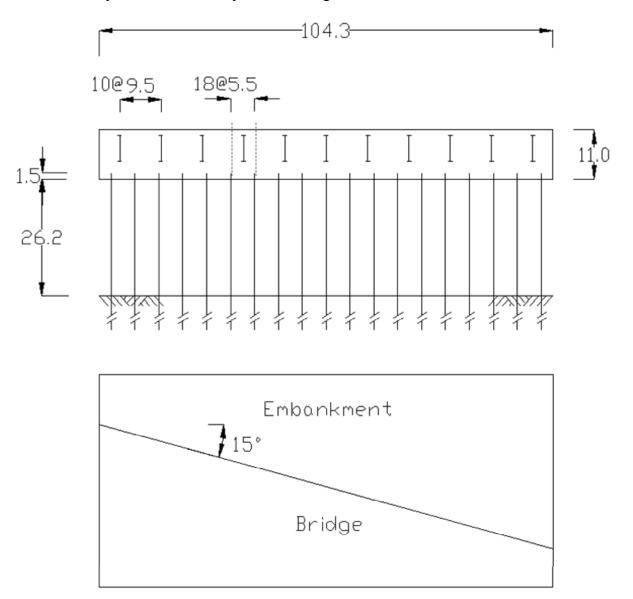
New Jersey IAB elevation and plan view (after Hassiotis et al., 2006),
